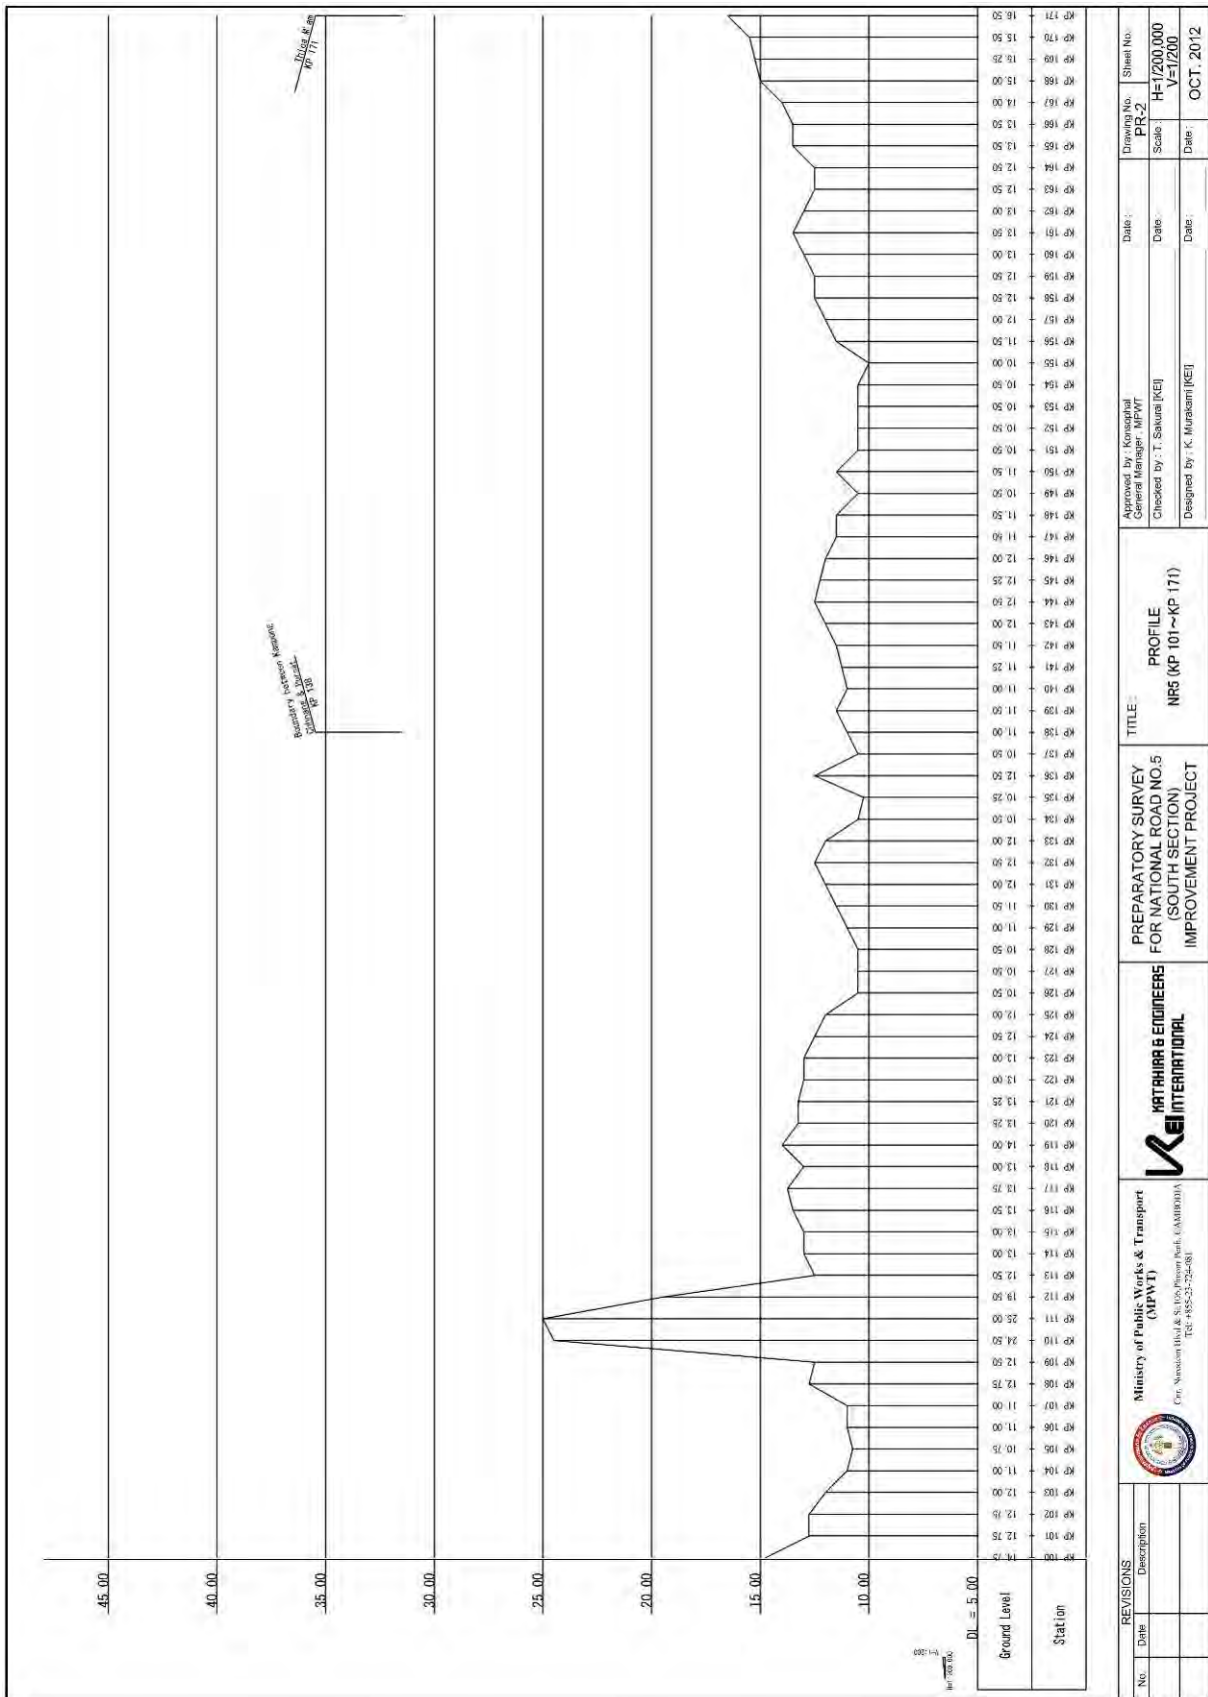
Estimated Road Elevation KP 101 to KP 171
